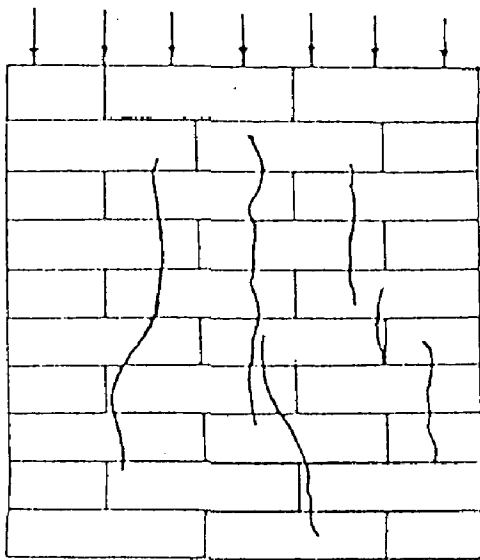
Typical failure pattern in a brickwork wall.
